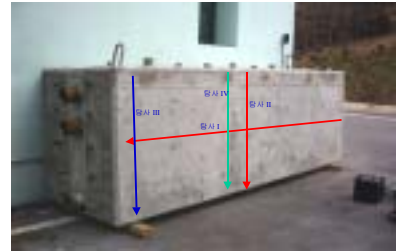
Mock-up specimen of quarantine building wall of atomic power plant
